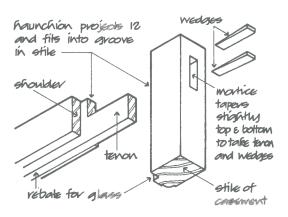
Mortice and tenon joint, the construction of buildings, Barry - 1958
